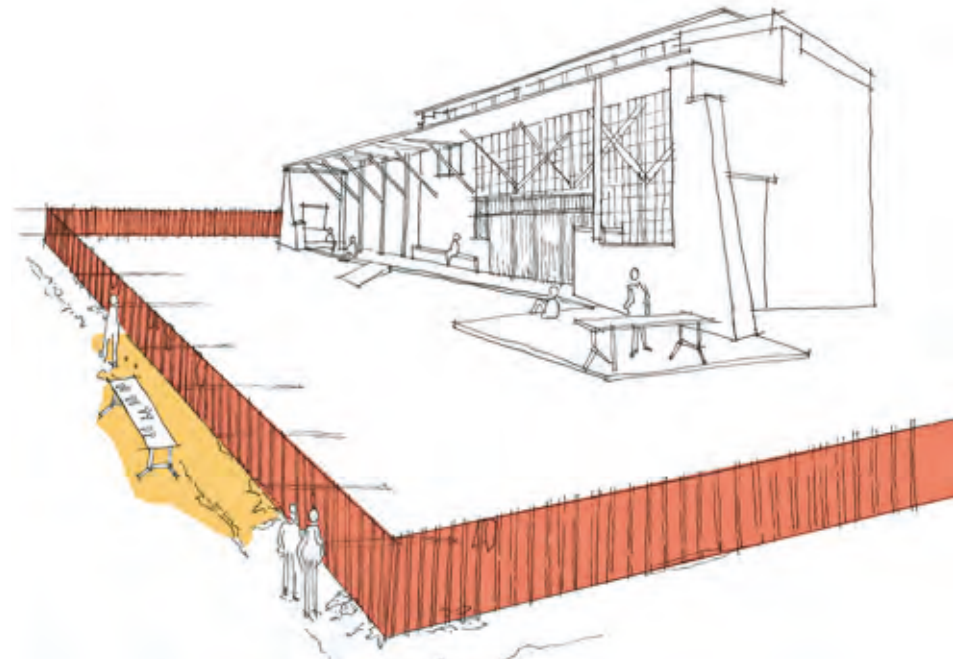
Sectional diagram depicting street permeability (Van Staden 2021).
